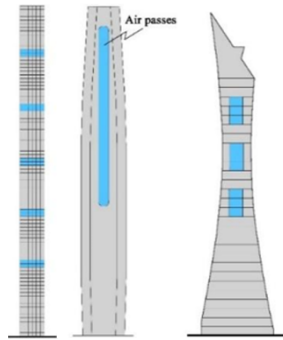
Air passes (a) 432 Park Avenue, New York, 2015; (b) Aspire Tower, Doha, 2006; (c) Greenland Group Suzhou Center, Wujiang, under construction
